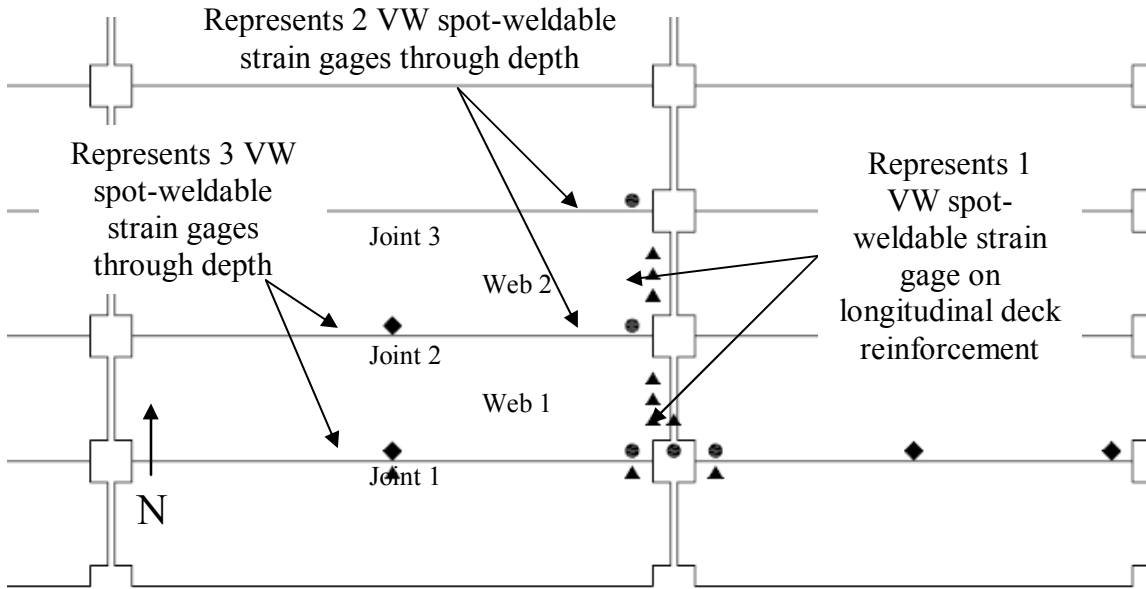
Plan view of Stage 1 of the bridge construction of Mn/DOT Bridge No. 13004 showing locations of instrumentation for continuous behavior over the piers
